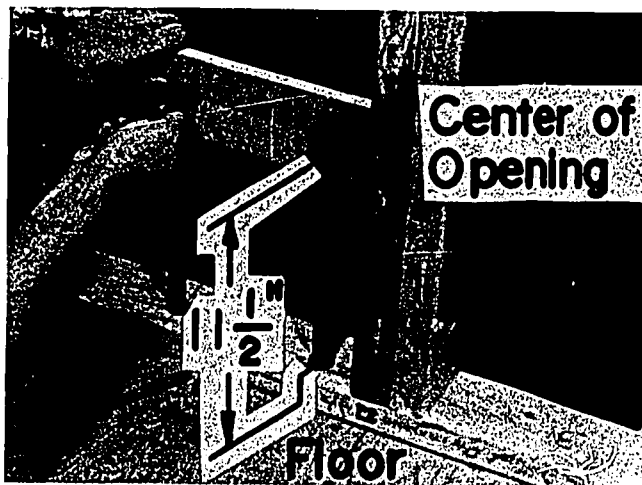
Marking for Placement of Screws (5" nipples are removed.)
